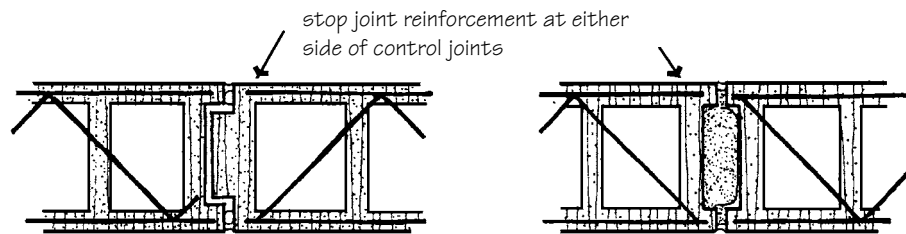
Joint reinforcement should *not* be continuous across control joints.
